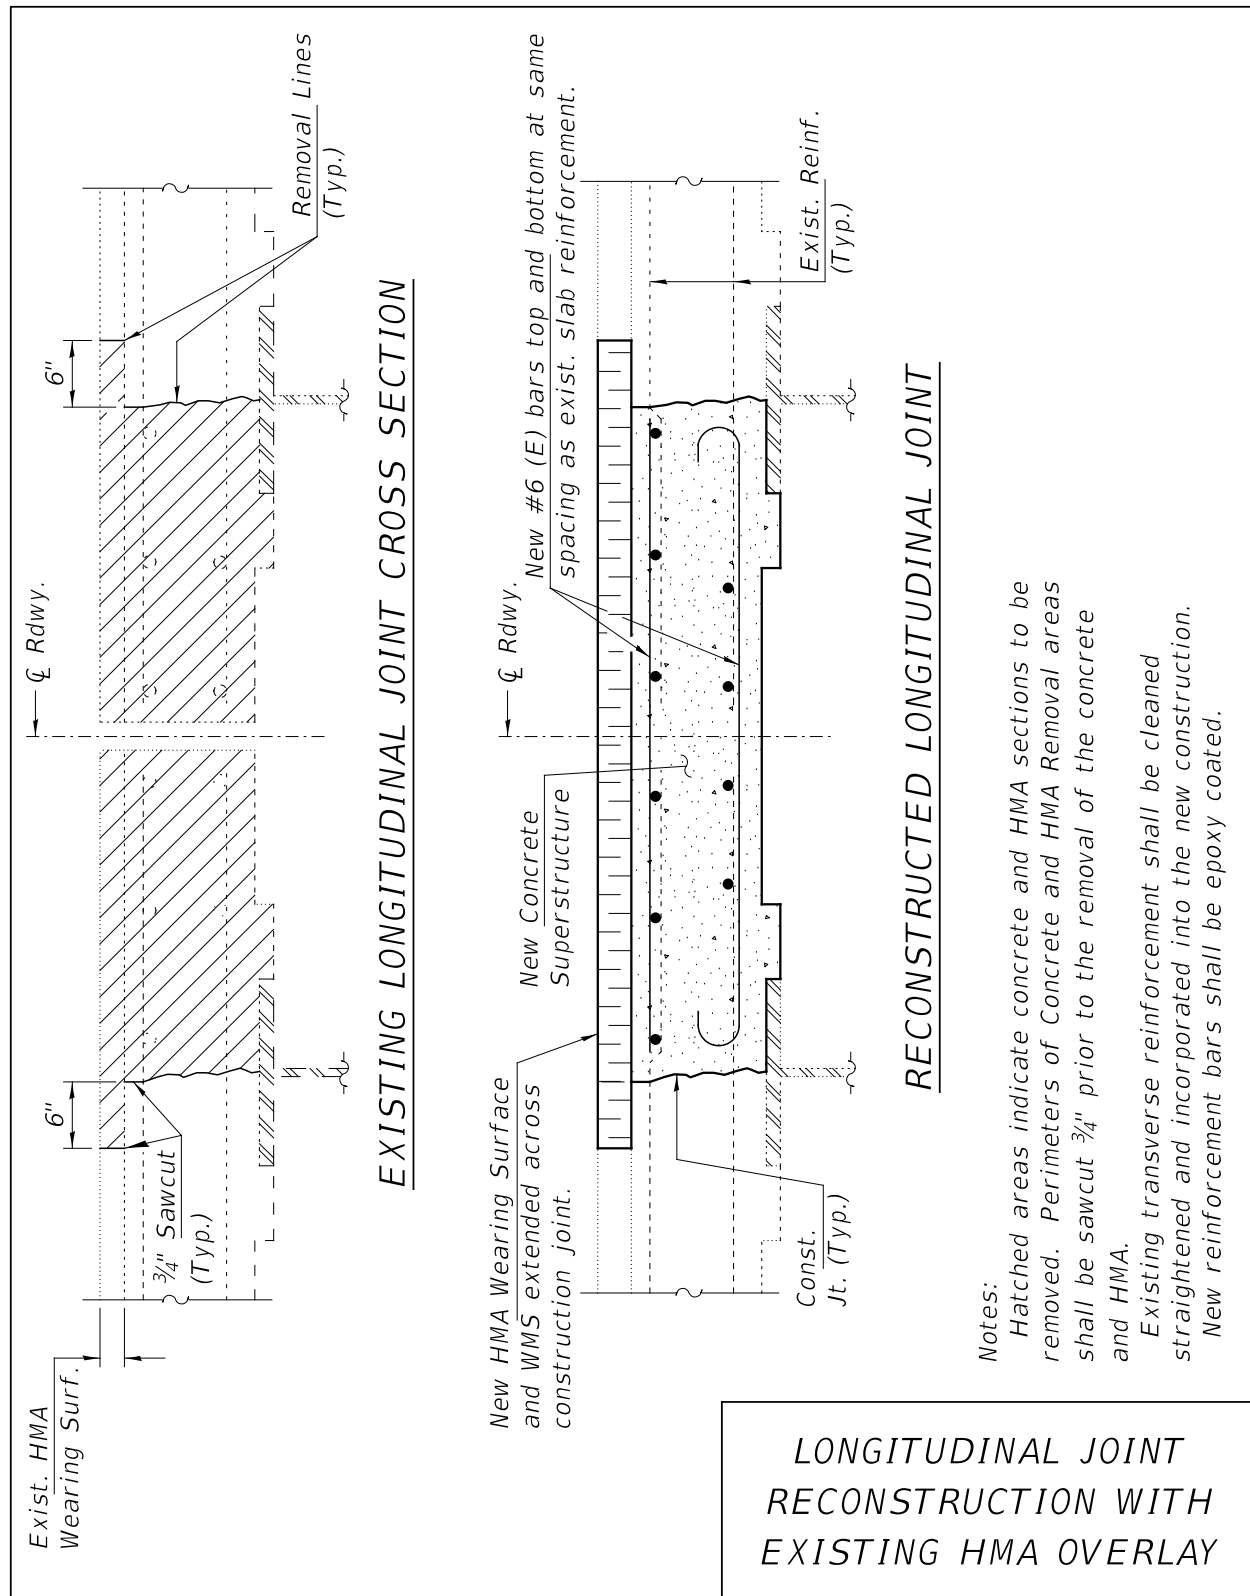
Longitudinal Joint Reconstruction with Existing HMA Overlay
